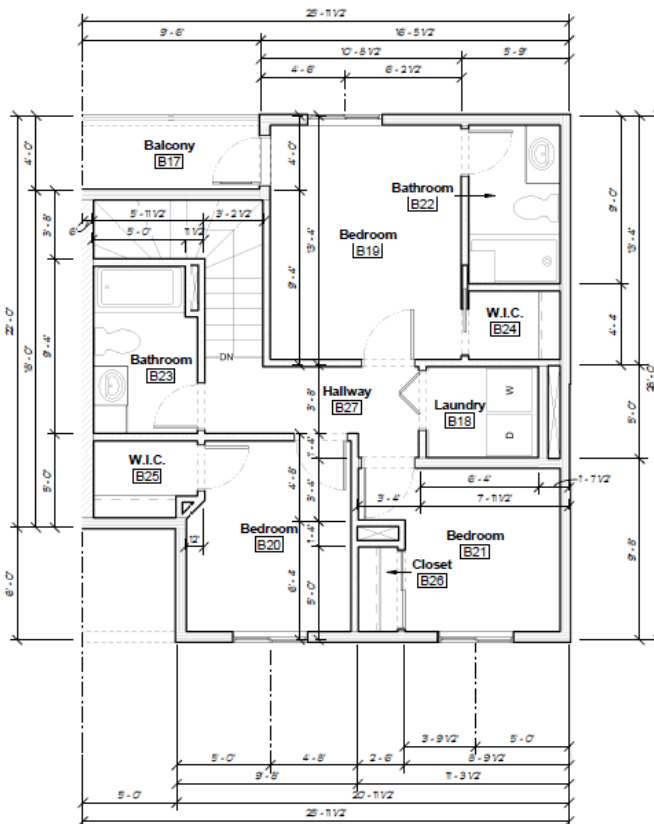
PLAN 2 FLOOR PLAN (4 BEDROOMS)
